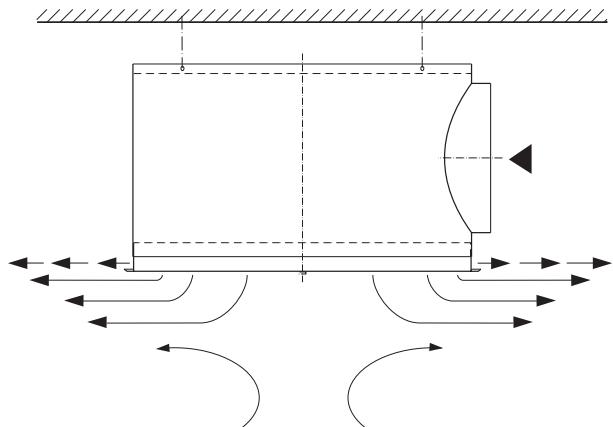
Jet pattern of outlet installed freely suspended from the ceiling
